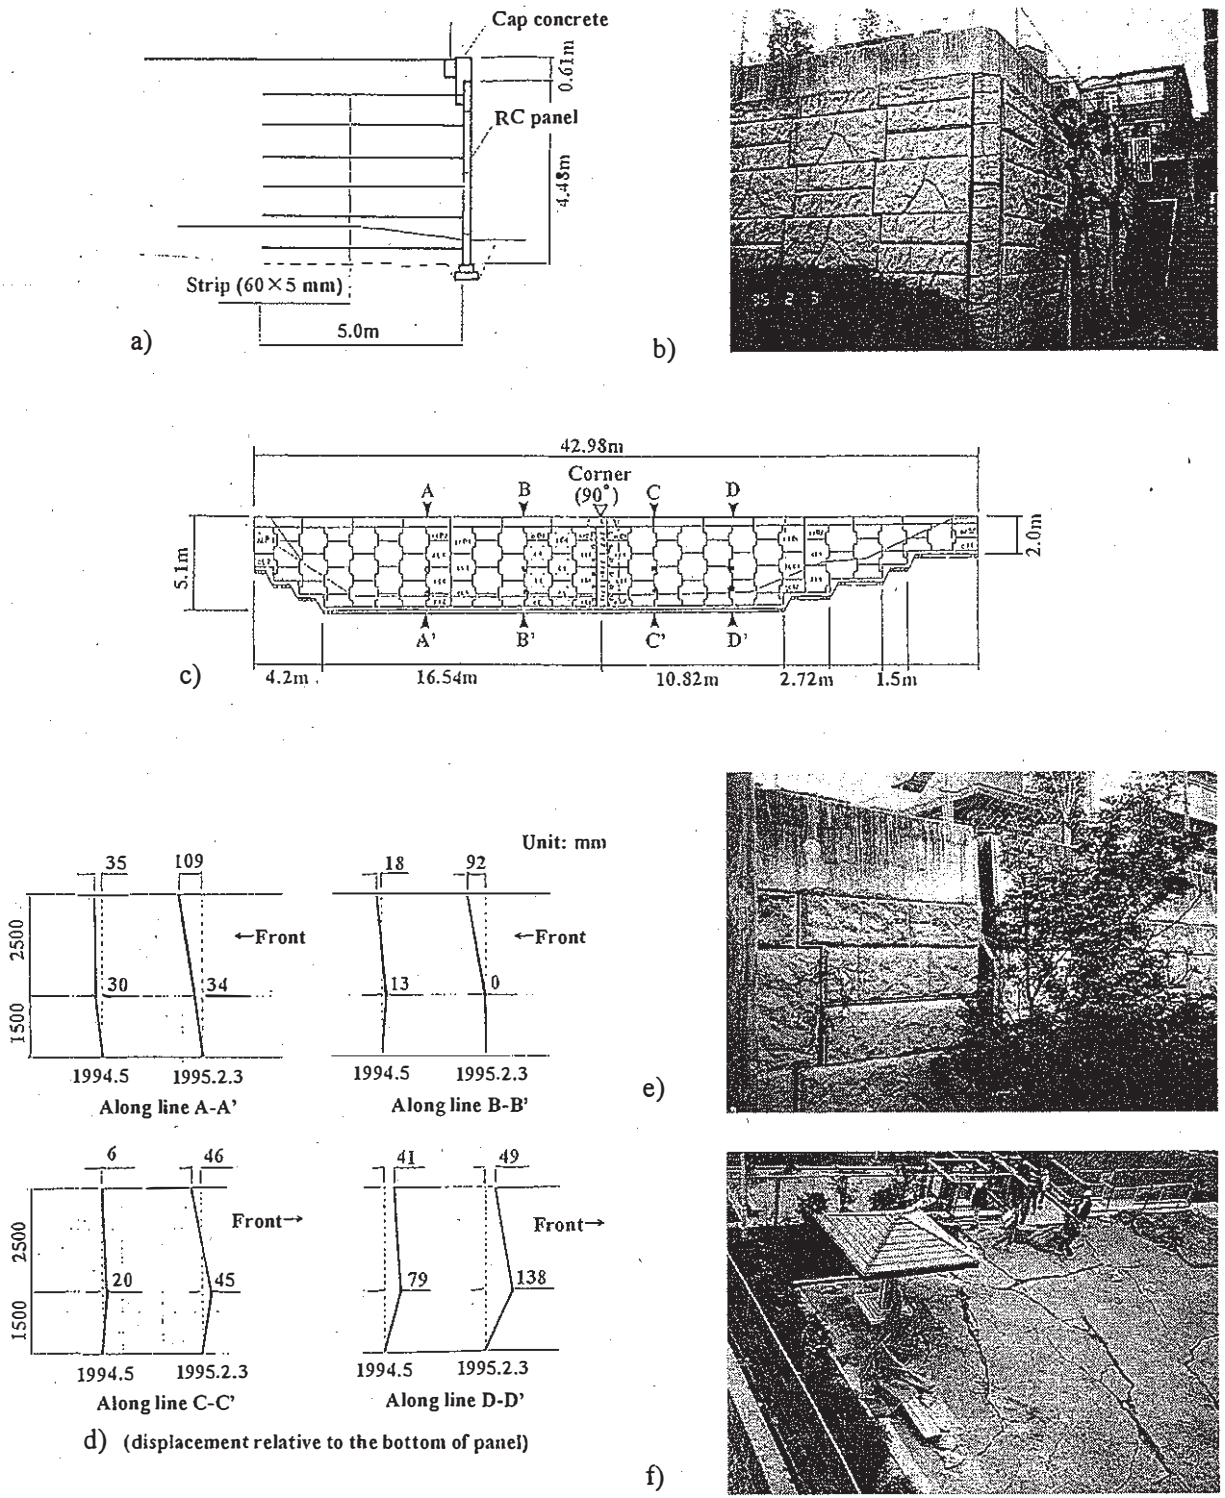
a) Cross-section, b) general view, c) expanded front view, d) wall deformation, e) opening at a vertical construction joint and f) cracking on the embankment surface, Terre Armee wall for Hosiga-oka Park, Kobe City (TA2 in Fig. 3) (JTAA, 1995).
